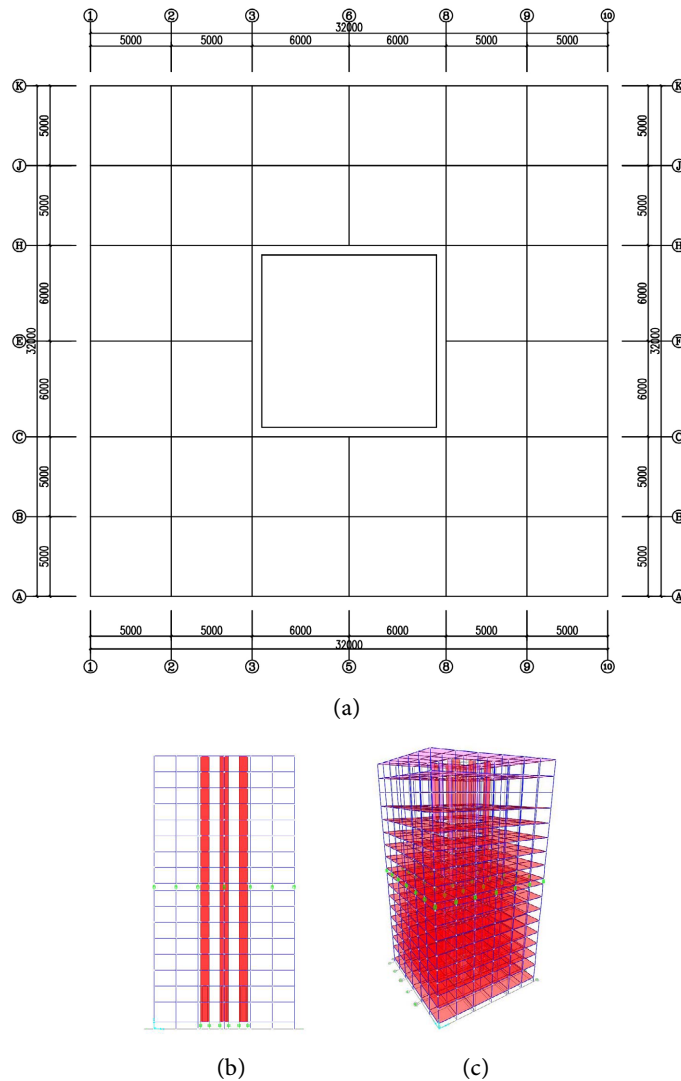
New staggered story isolated structure. (a) Plan; (b) Elevation; (c) 3D.
